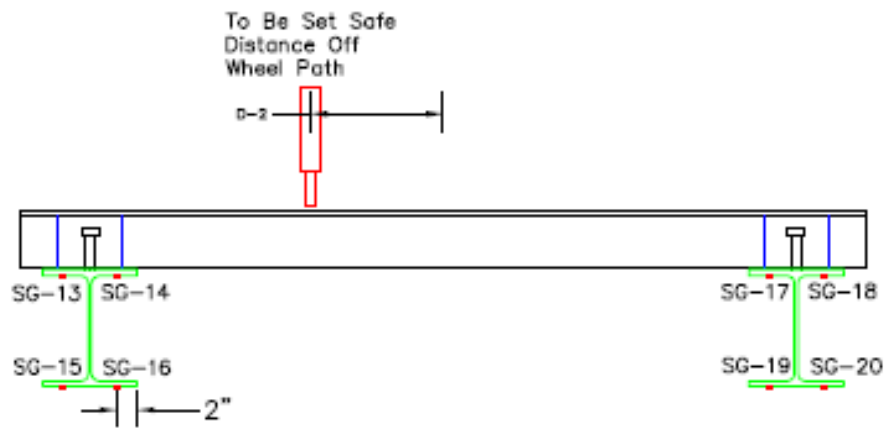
Instrumentation Plan on Decks and Support Beam
